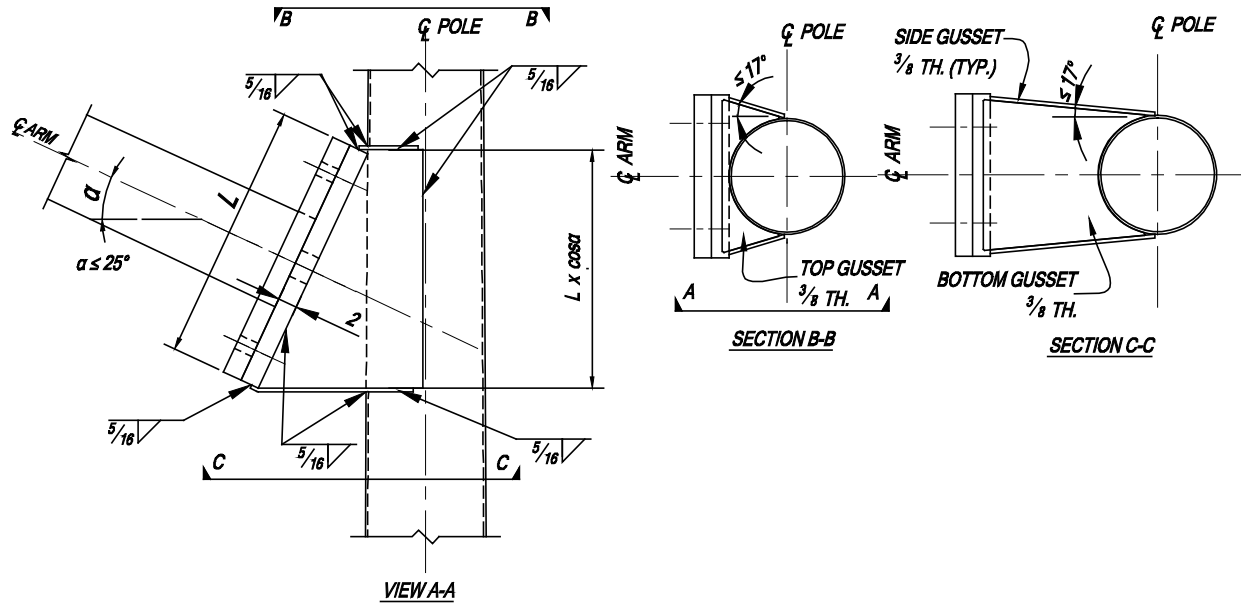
Details of fillet-welded gusseted box connections
